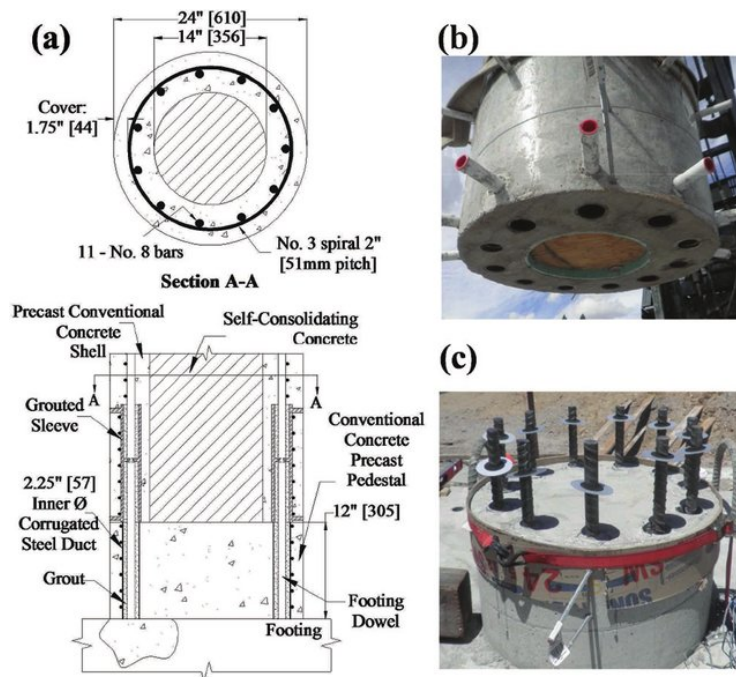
Example of a connection by means of protruding bars and cast-in ducts; (a) cross-sectional details, (b) cast-in ducts in column and (c) protruding bars in column base [82]
